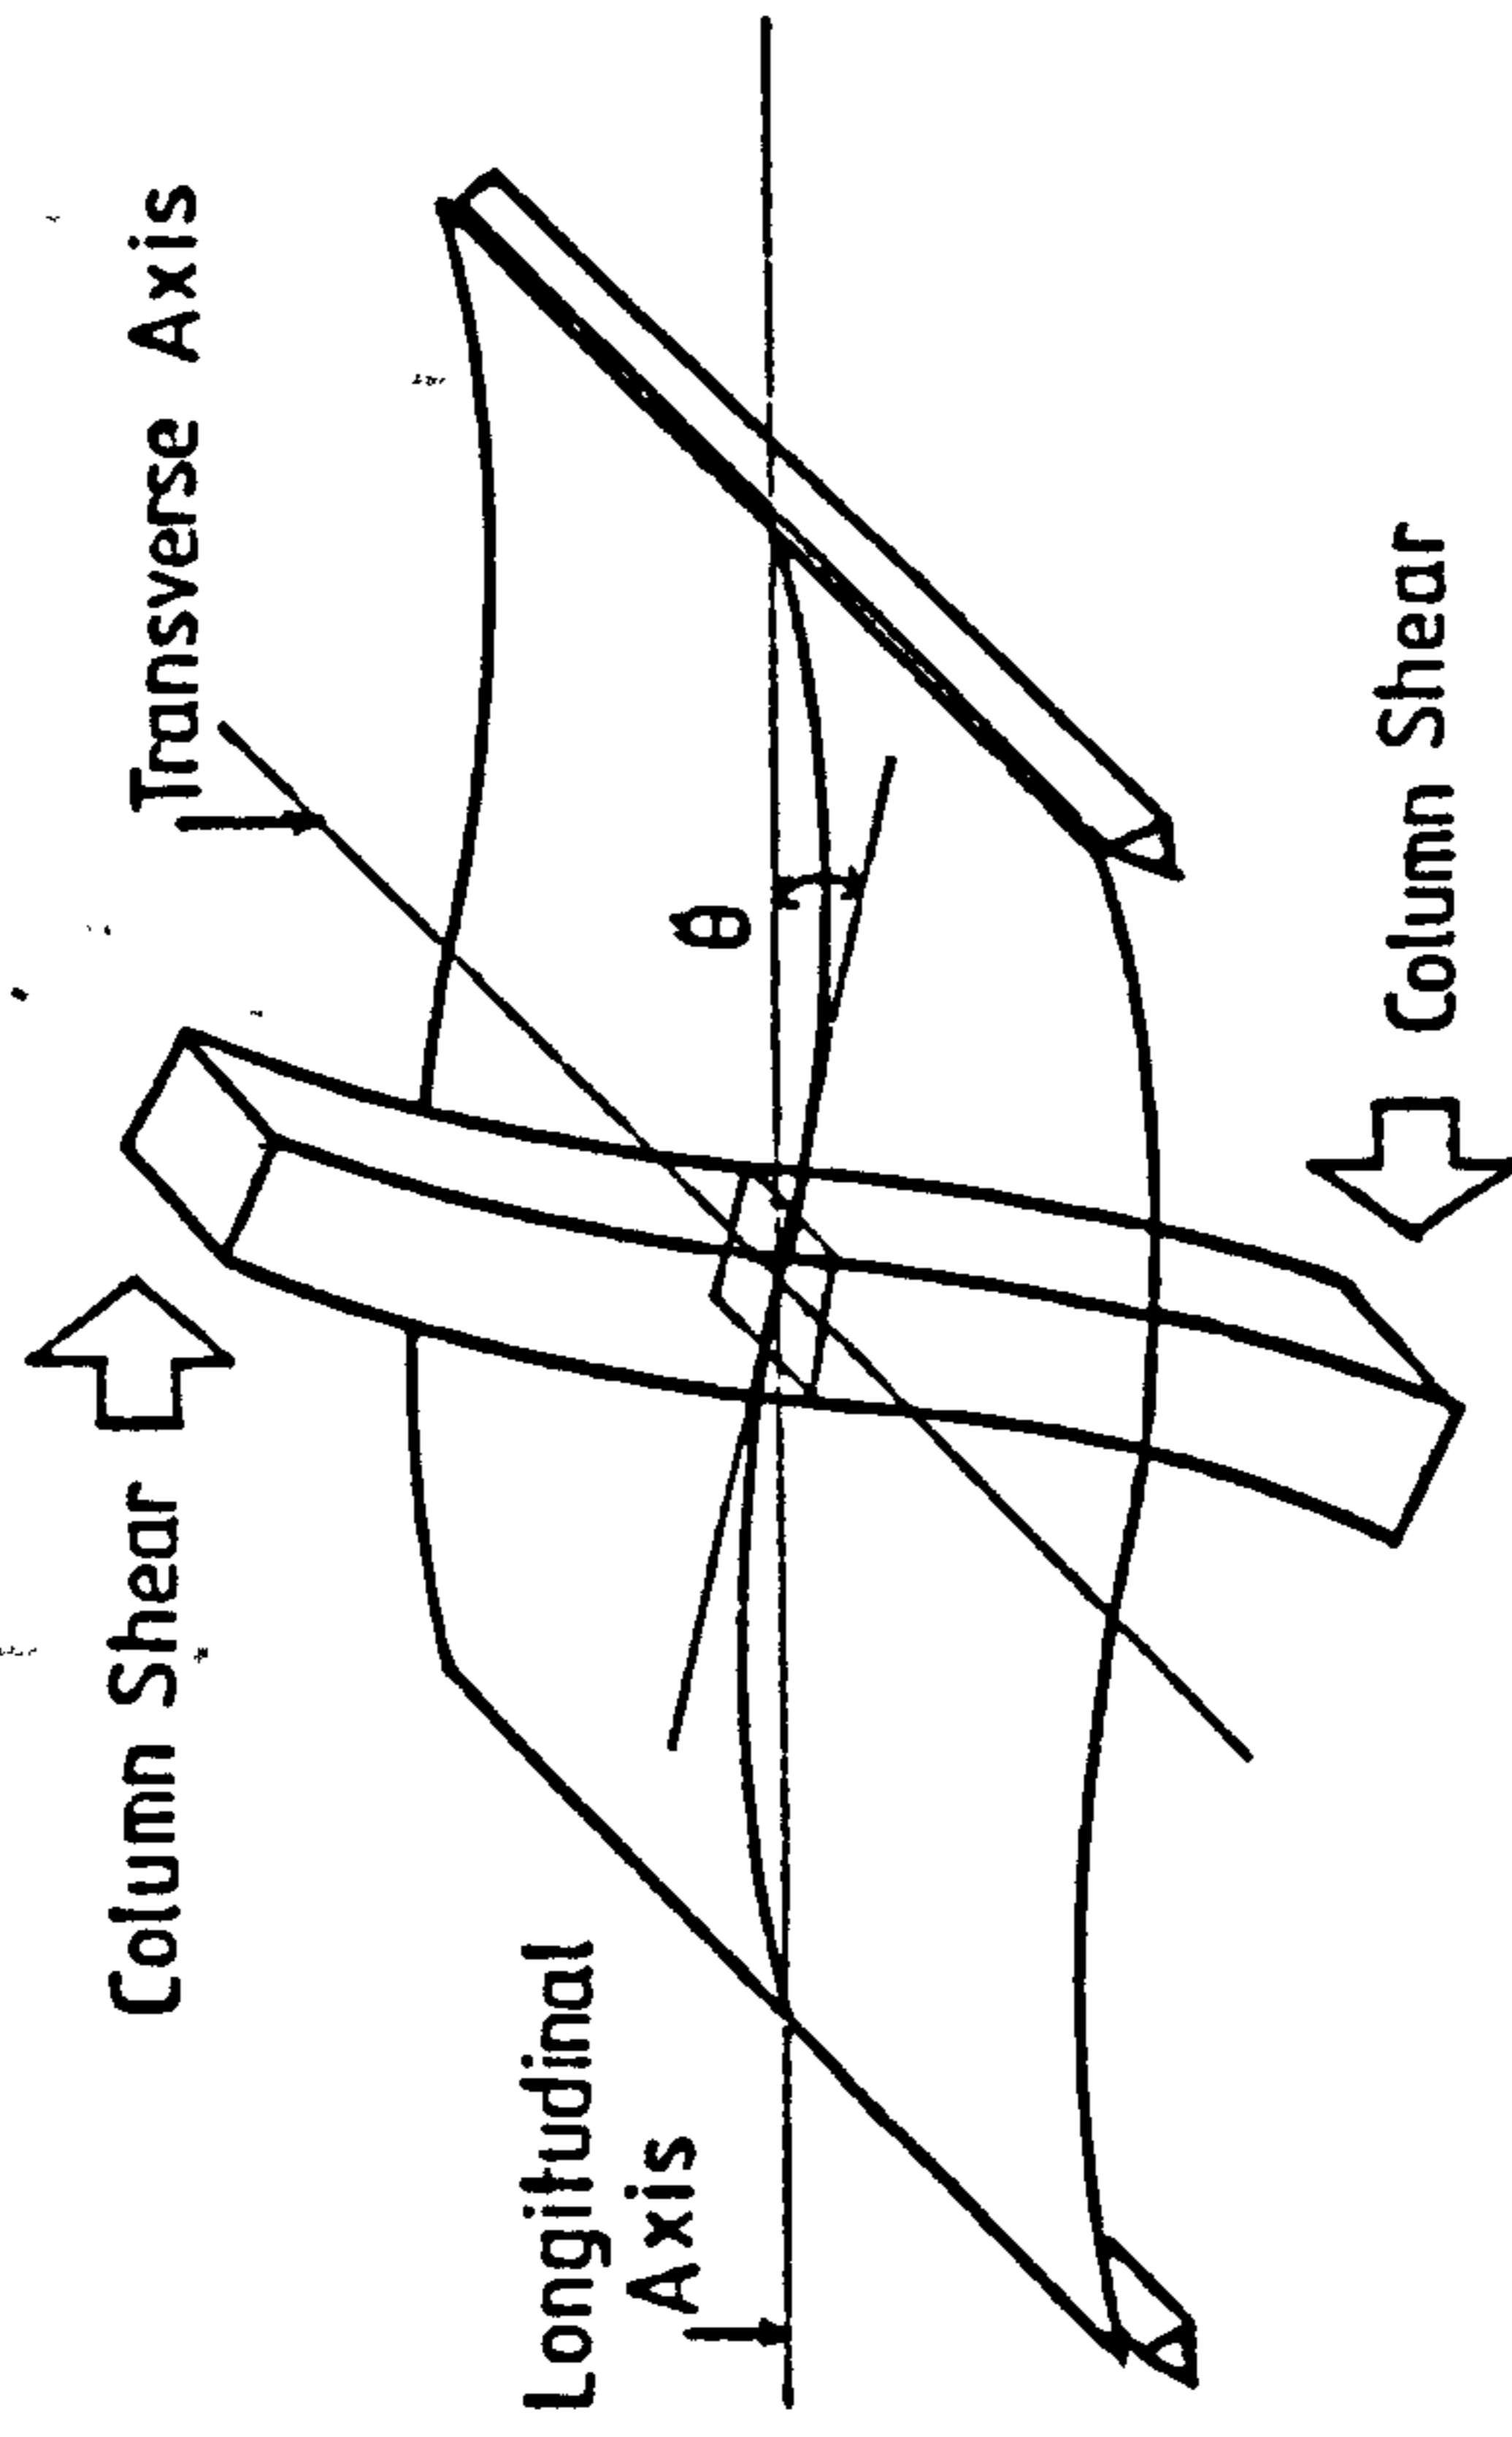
TYPICAL PLATE / COLUMN FRAME ELEMENT
